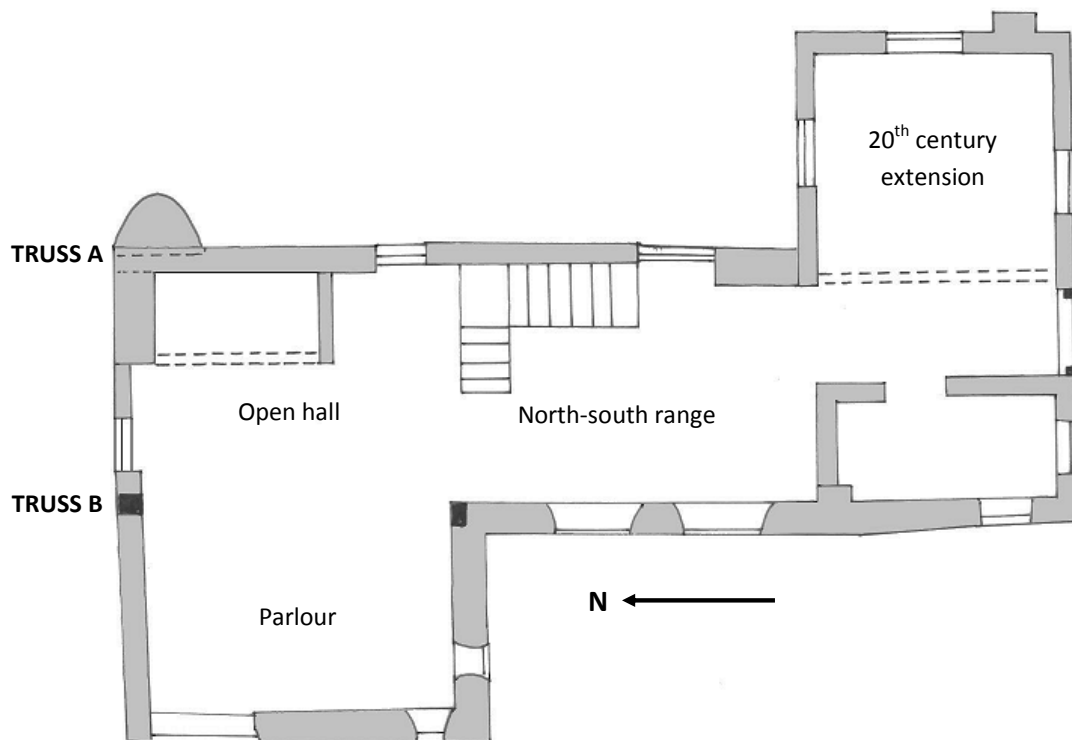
Ground floor plan of Castle Cottage (based on a plan from the Wiltshire Buildings Record archive)
